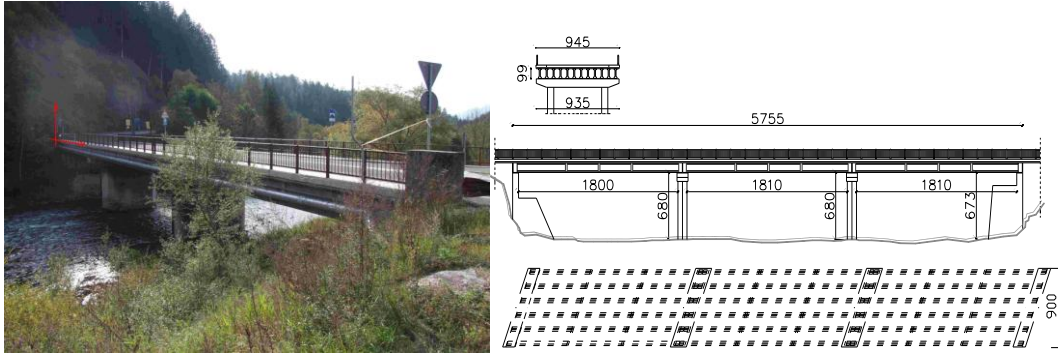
SP31 Bridge on River Avisio (a) overview (b) Plan view, elevation and cross-section of the deck
